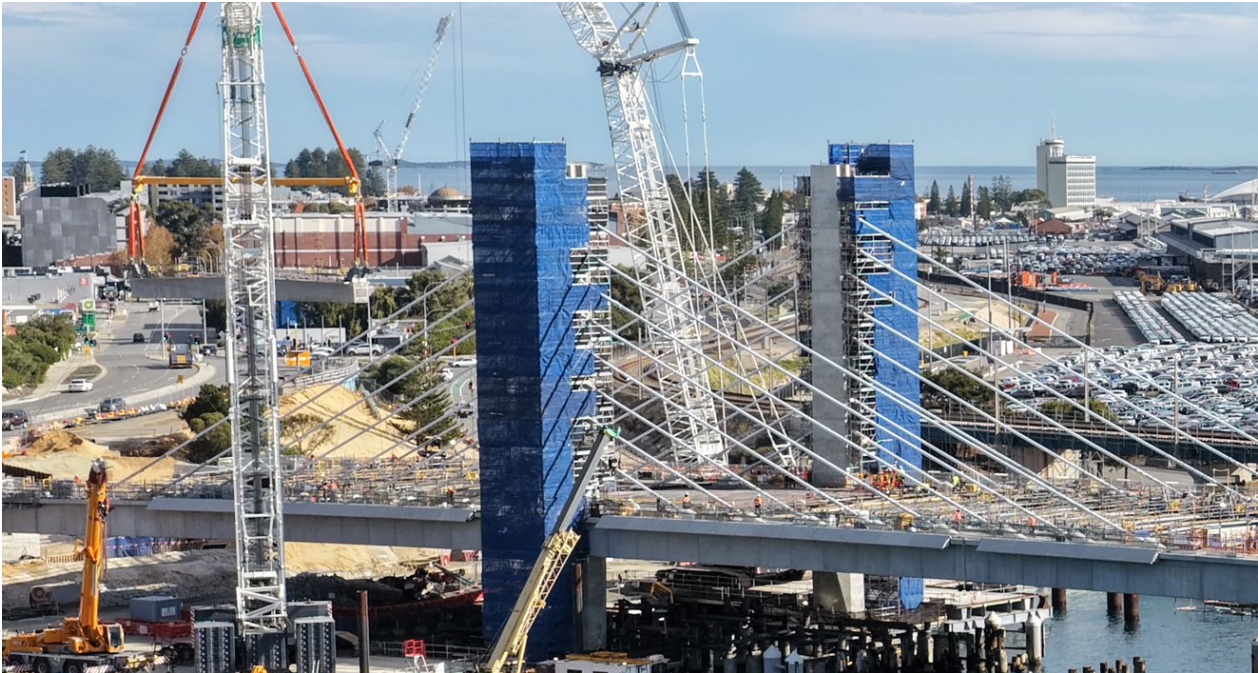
Parapet installation underway on the segments and scaffolding on the towers.
